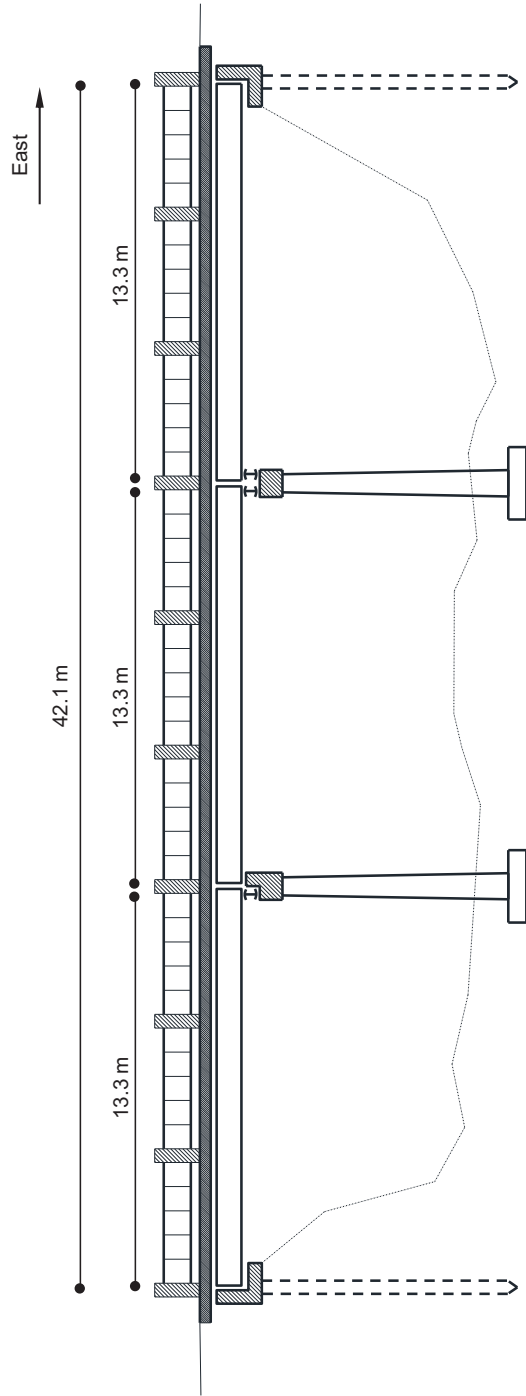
Elevation of Colorado State Highway Bridge E-17-AH.
